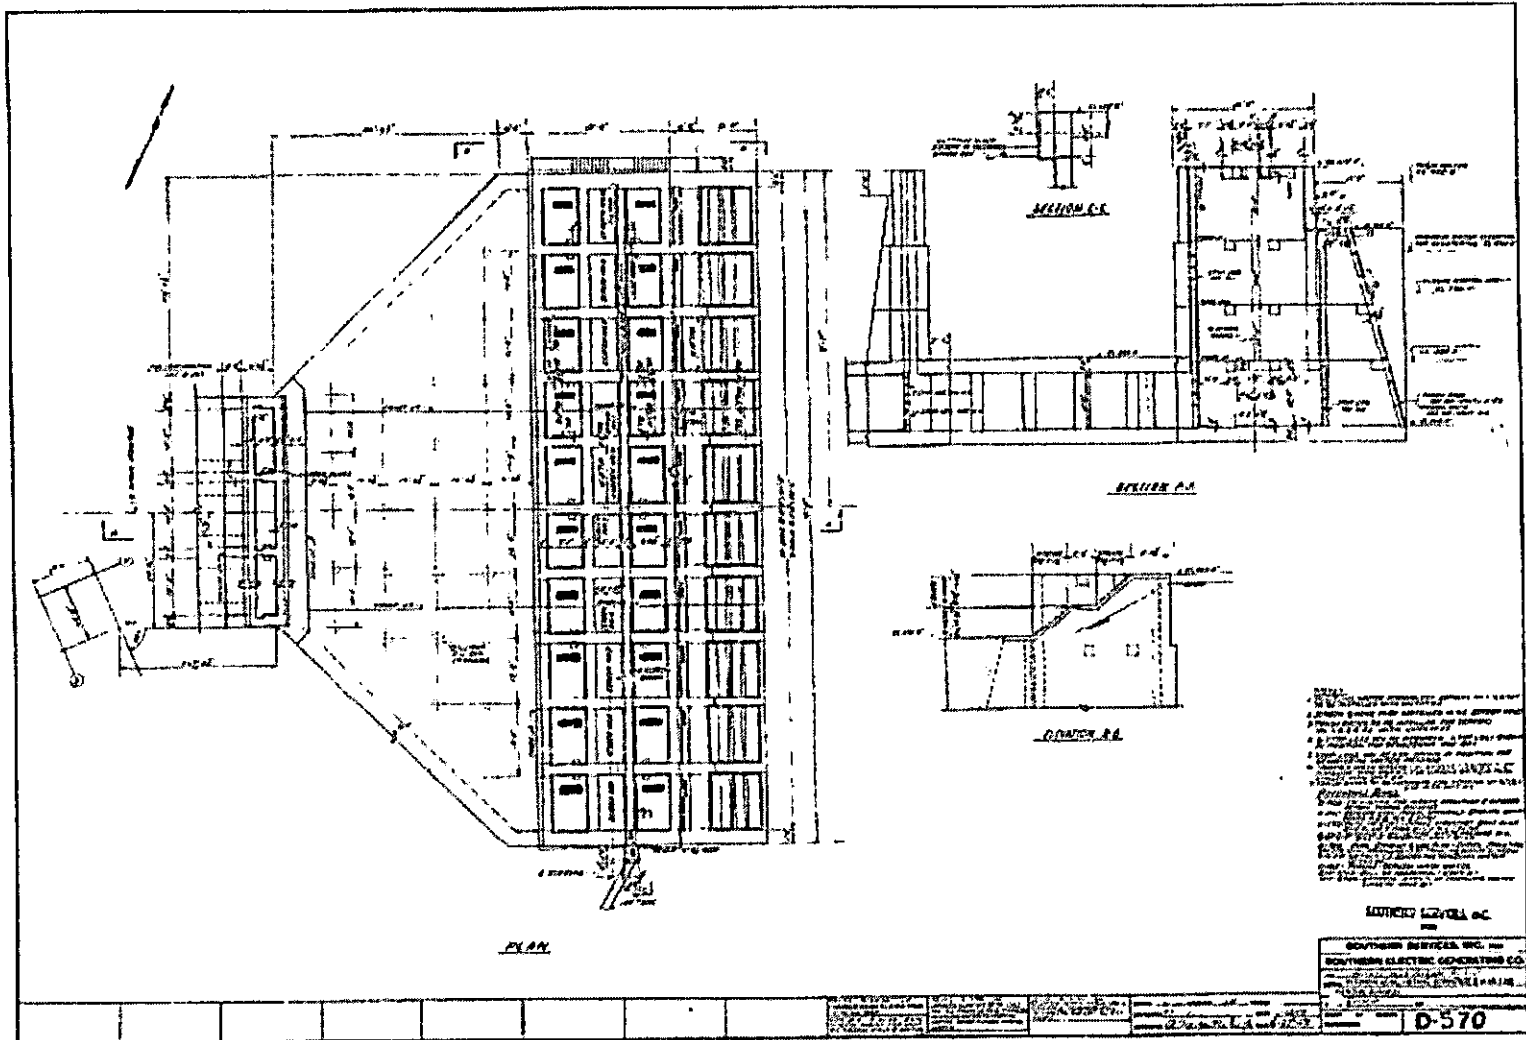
E.C. Gaston Steam Plant Intake Structure Plan View
